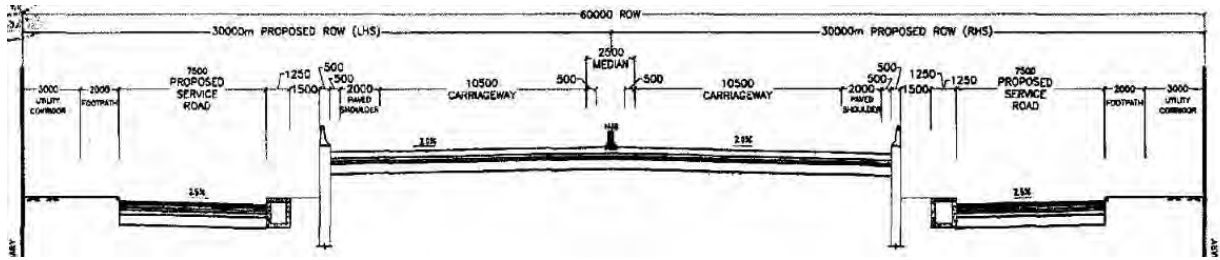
Typical Cross Section for CUP/PUP with both side service road 2.5m median (TCS-9A)
